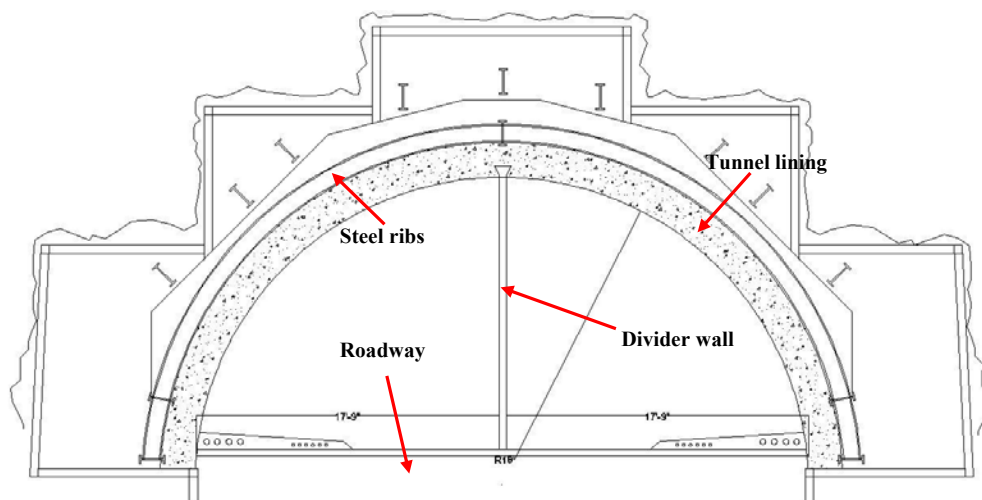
Eisenhower Tunnel plenum view indicating the interior precast divider wall, structural steel ribs, roadway, and concrete tunnel lining.
